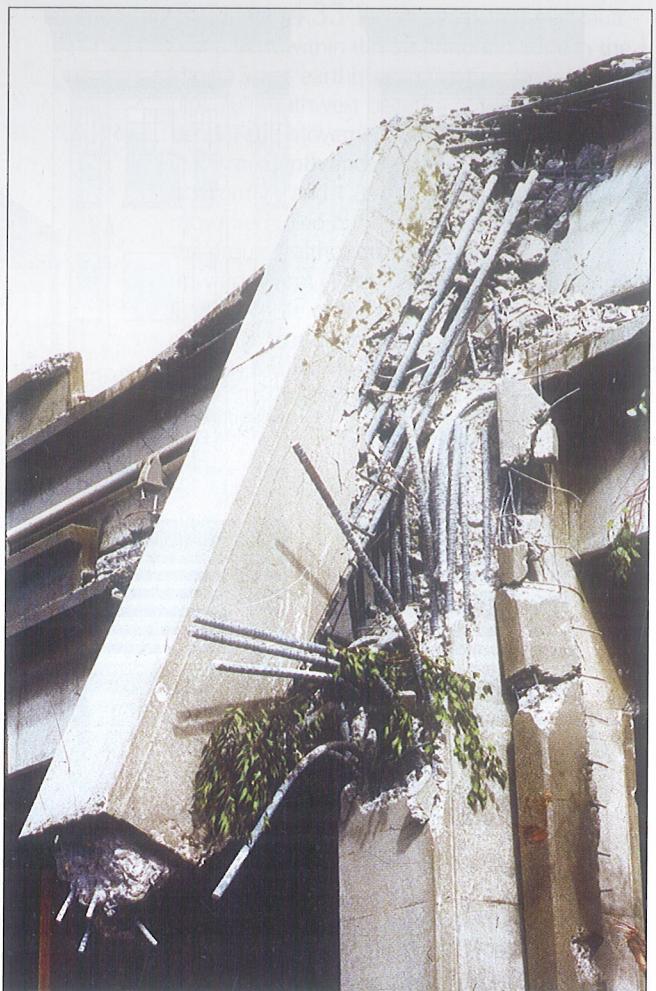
The support columns of the Interstate 880 structure failed at the joints. There were 20 #18 bars of steel in each column, but they were discontinuous at the joints and failed there. Photo from Dames and Moore.
